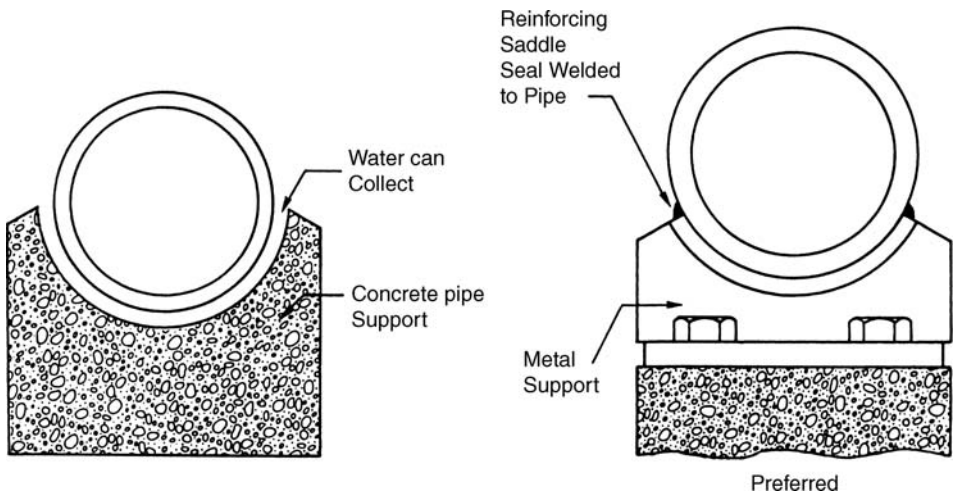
Ceiling and a metal cradle avoid accumulation of water under a pipe in outdoor construction
